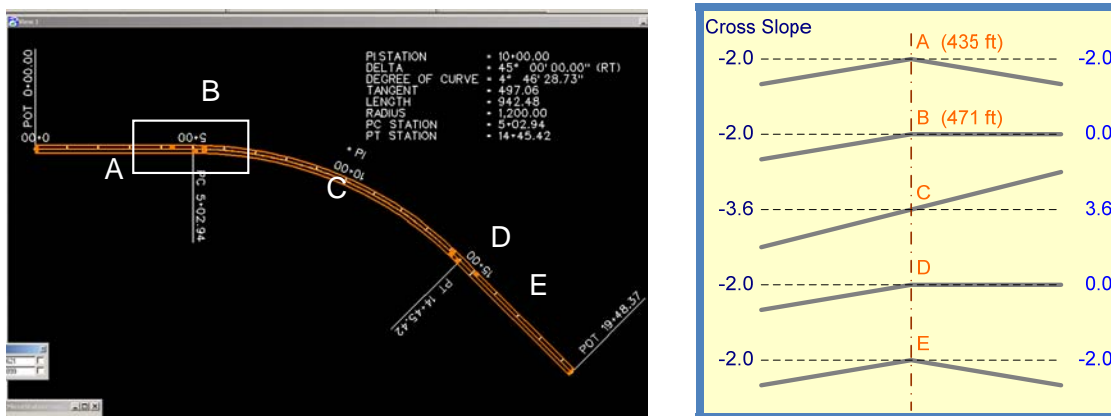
Superelevation transition with change in roadway cross-slope and stormwater drainage paths
